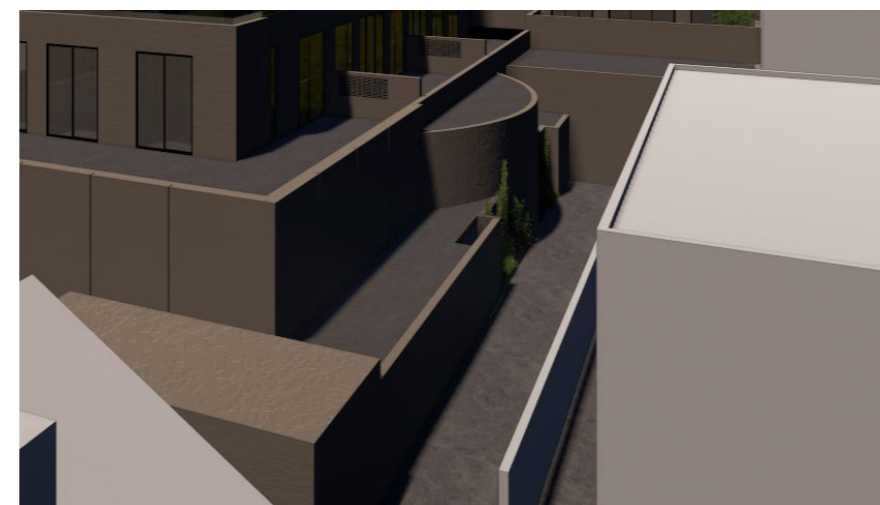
3D oblique view of the proposal's interface to the southern laneway and 25 Irymple Street from the west (December 2023 scheme) (source: Cera Stribley)
